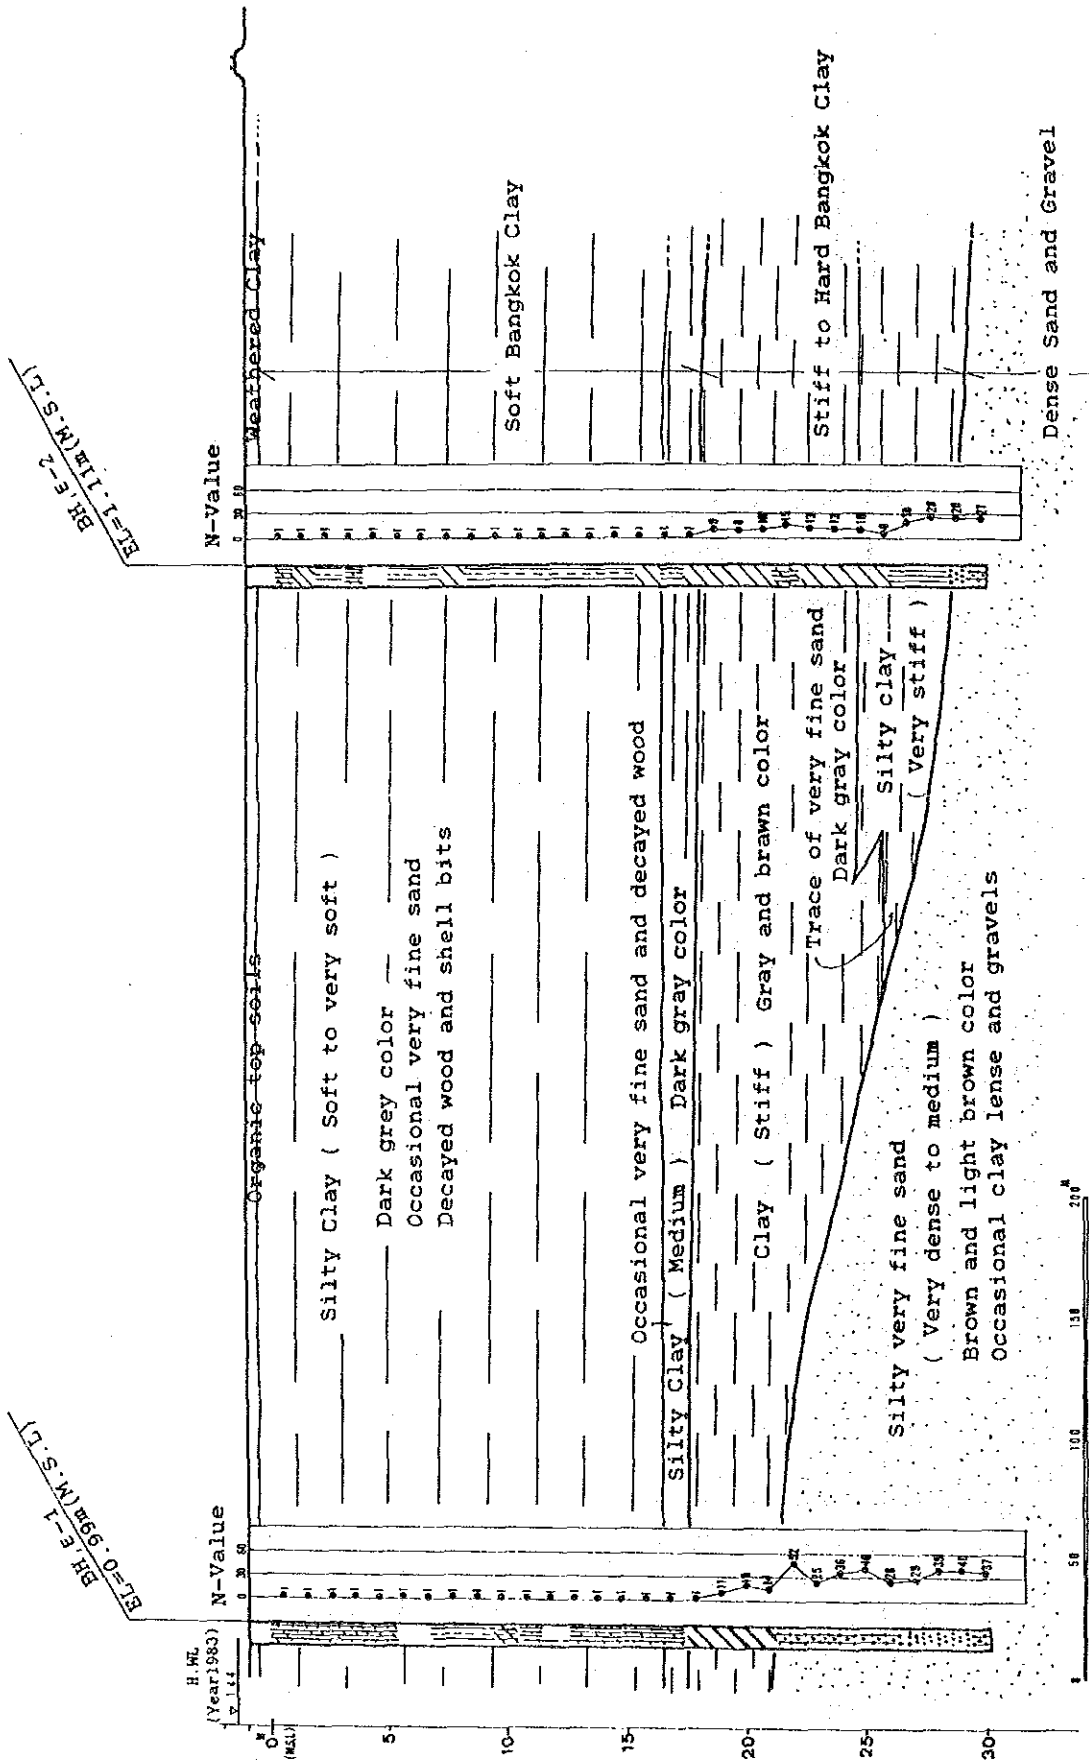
Longitudinal Soil Profile (East Area)
